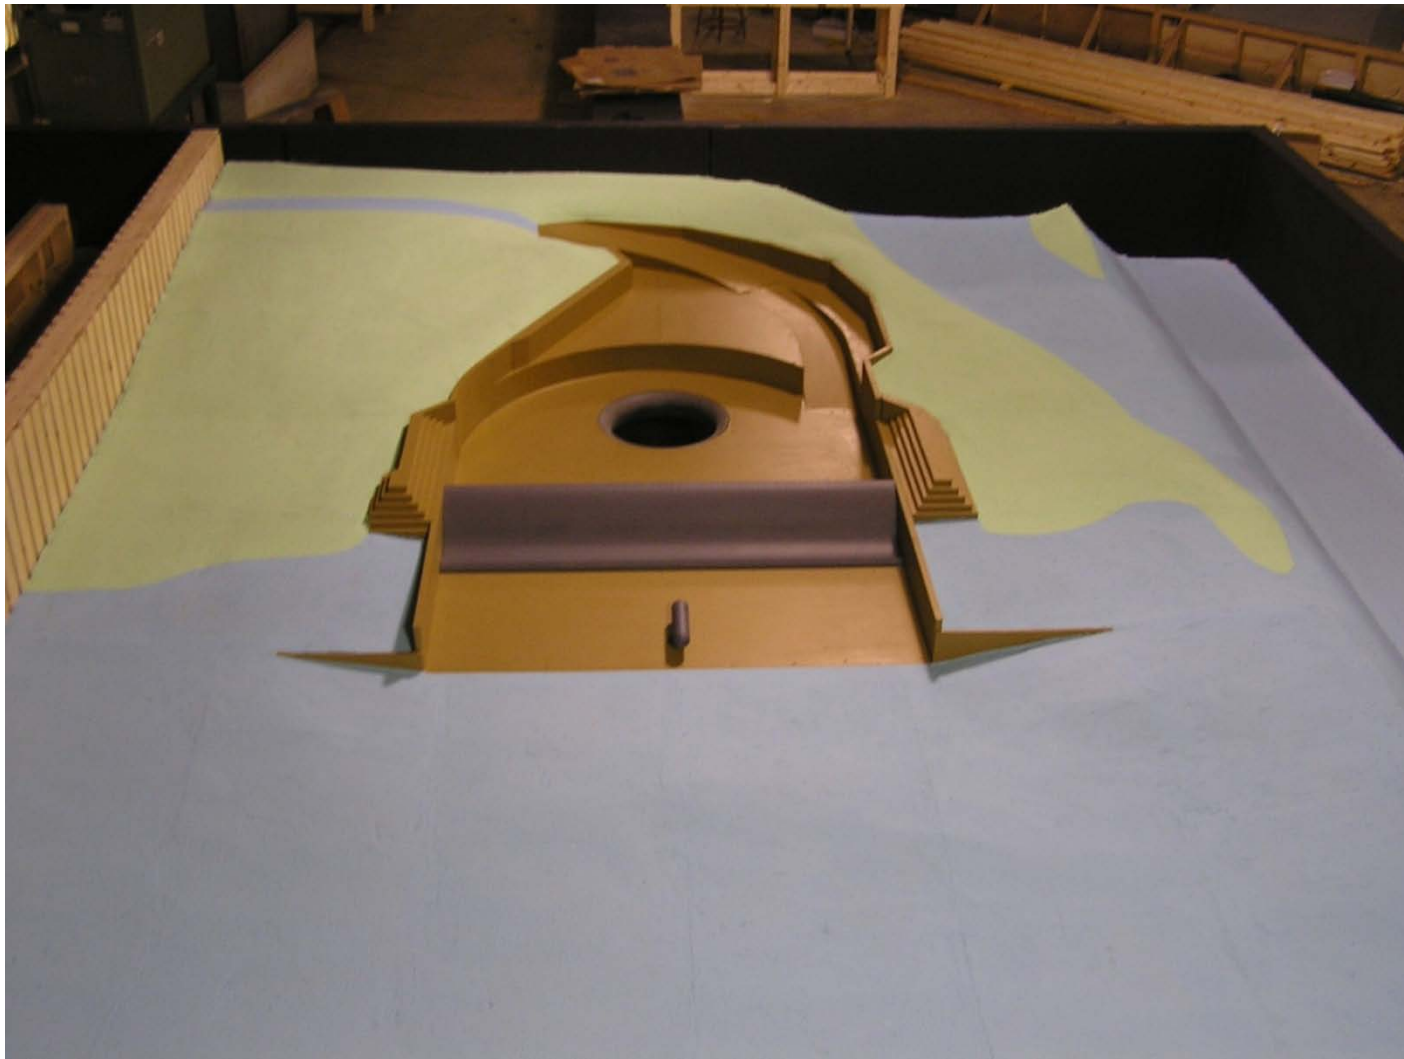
Waller Creek Tunnel Project; 1:33 Scale Model-Outlet
